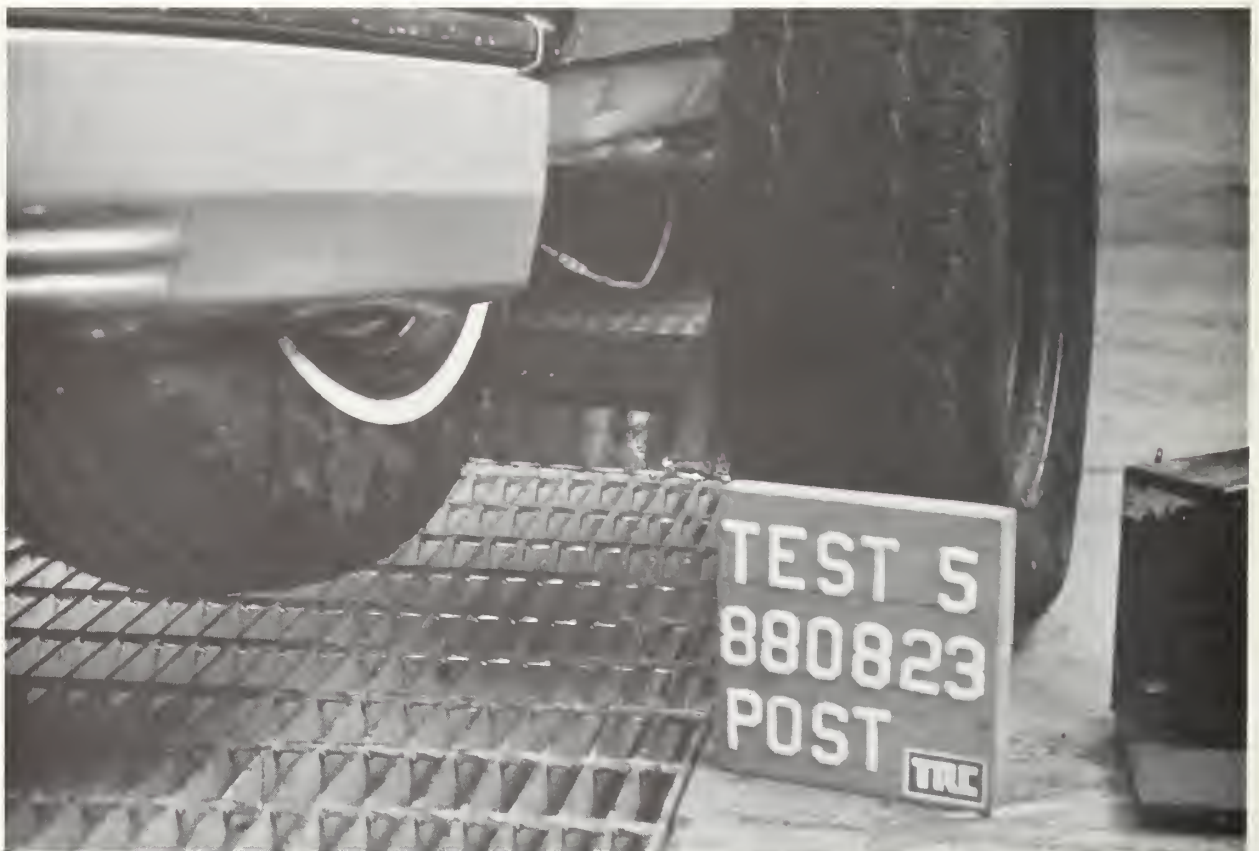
POST-TEST CLOSEUP - VIEW 7
